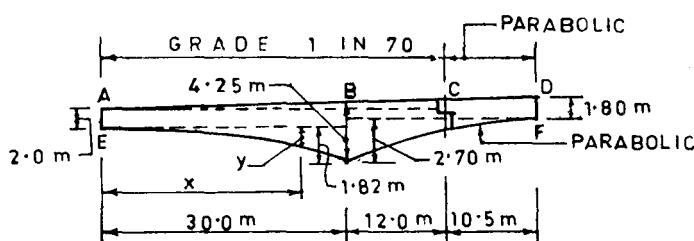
TOP AND BOTTOM PROFILE OF MAIN GIRDER ( Example 11.1 )
